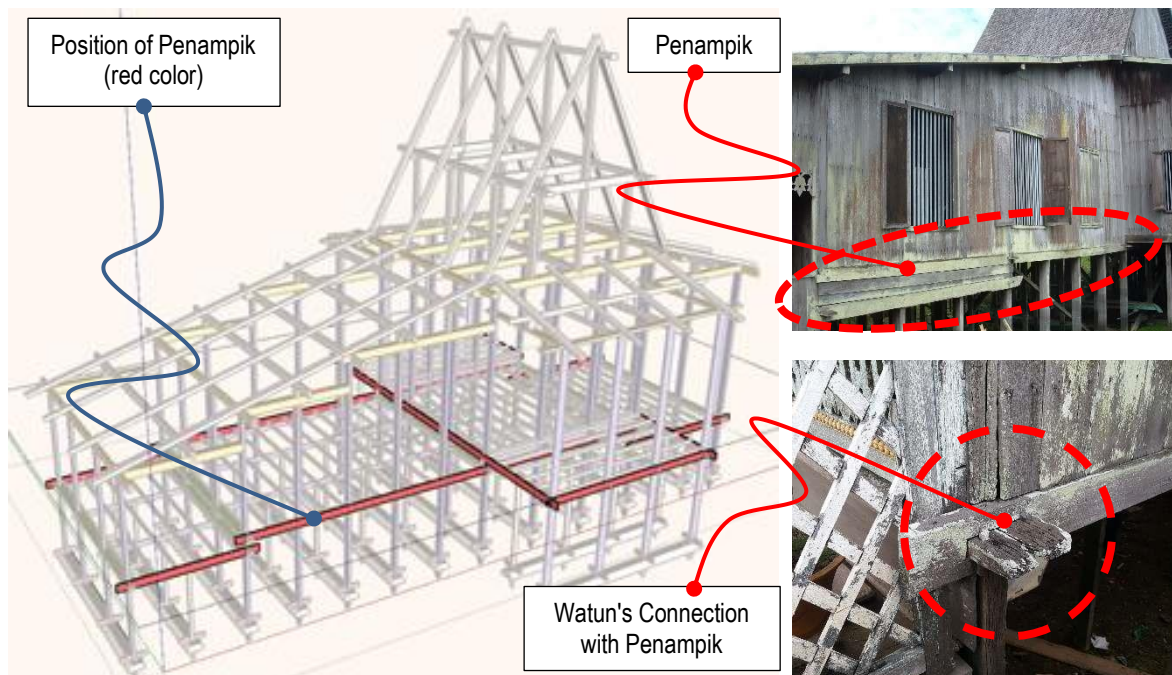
Penampik's position and its connection with Watun in a traditional Banjar house.
